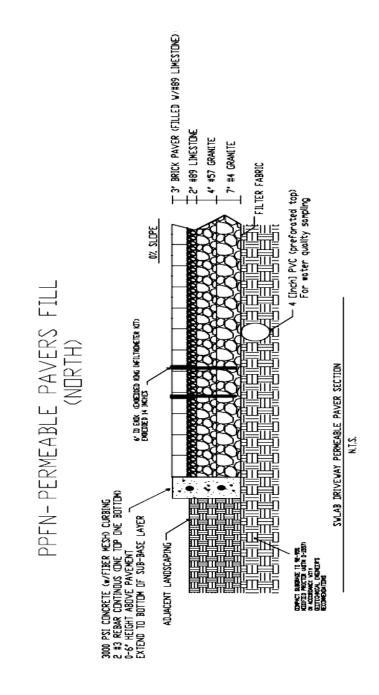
Cross-sectional view of Permeable Pavers Fill (PPF)
